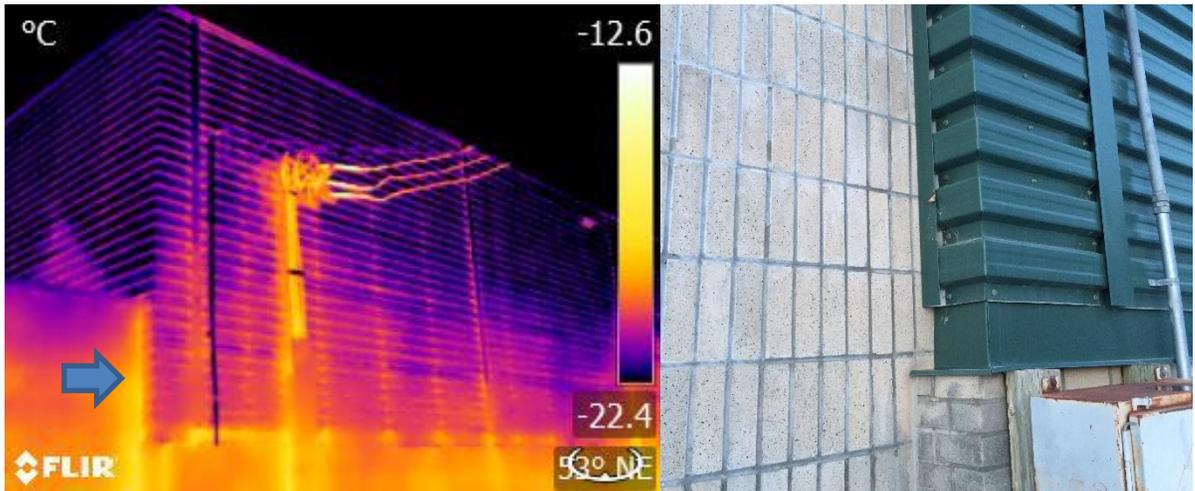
Air leakage vertical intersection of siding and brick cladding. South elevation at West end (refer to Photograph #31). Air leakage at this location is typically a result of discontinuous air barrier at the intersection of the cladding materials. Warm, moist air from within the pool building leaking through this location will create condensation when in contact with cold outdoor air or colder building materials. The condensation created can cause deterioration of the masonry over the long term.
